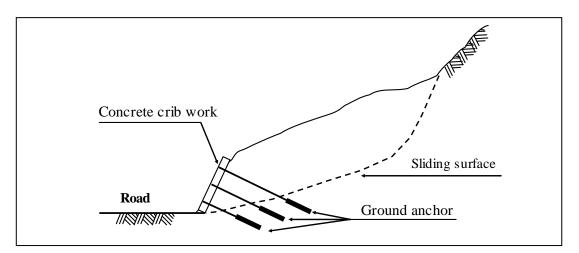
Landslide Stabilized with Ground Anchors
